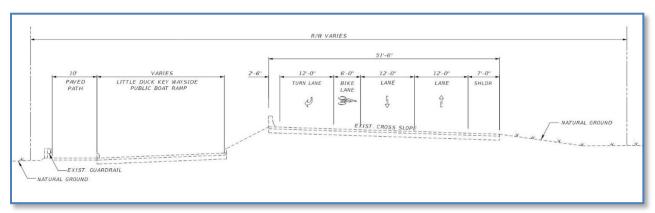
Typical Section: Roadway Approach at Bridge West End
